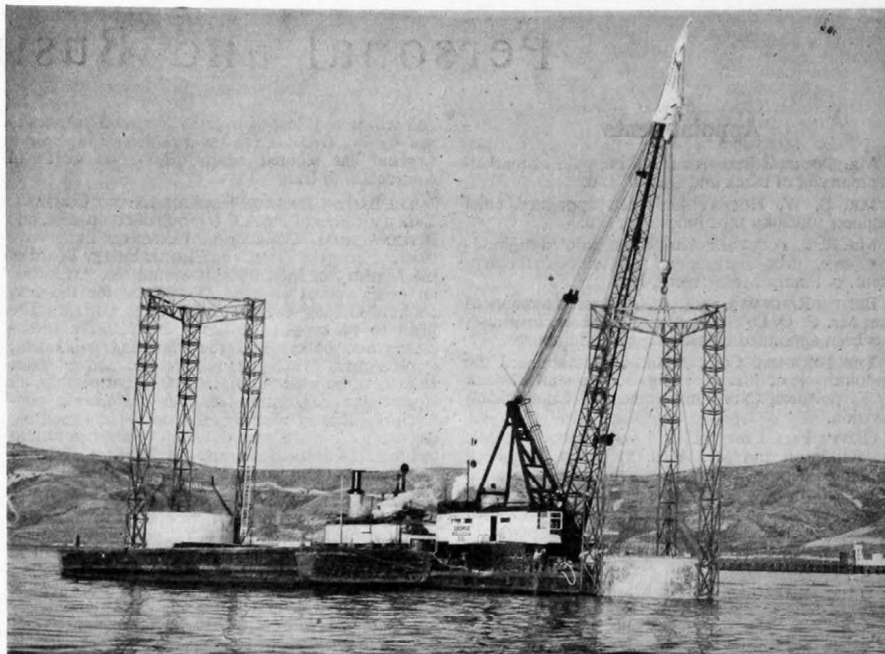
Erection of steel guide towers along the sides of a bell pier shell for location during lowering
